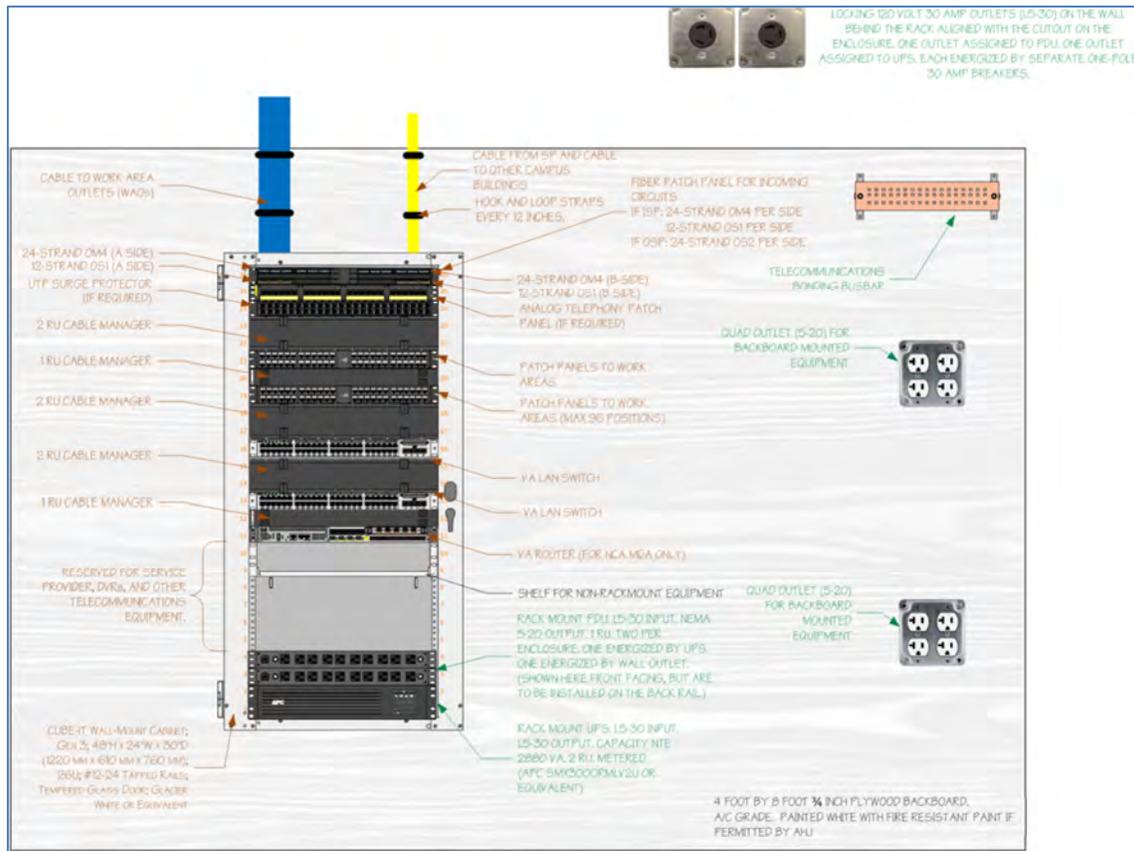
TE Installation Elevation (OIT Design Guide Template)
